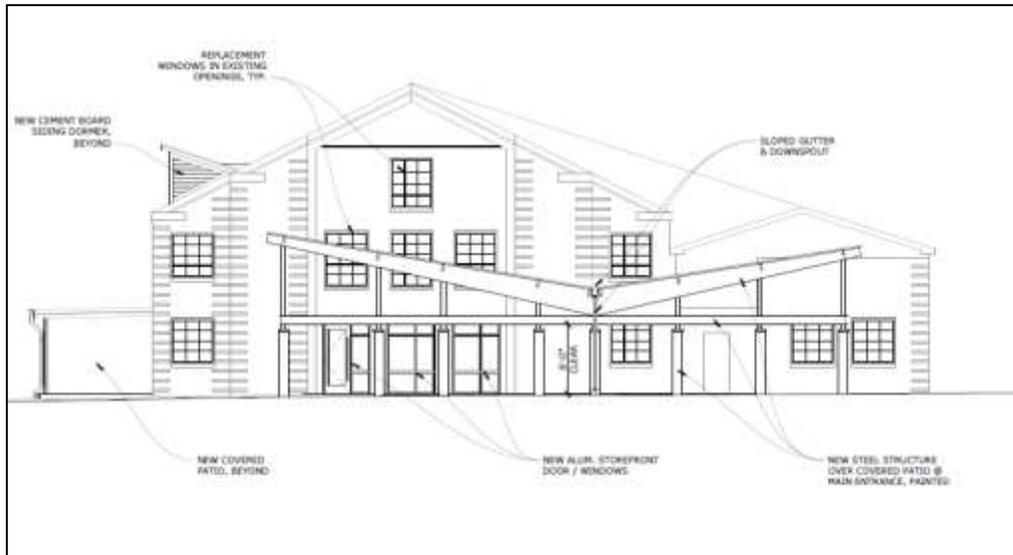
Proposed front elevation, showing the new butterfly-roof patio covering.
